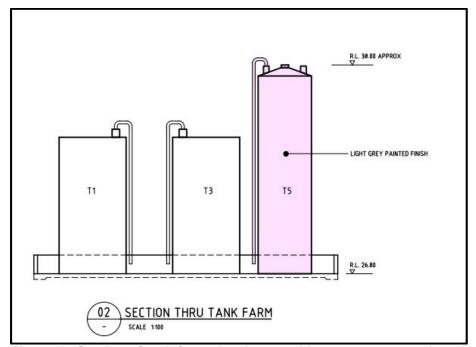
Section of tank farm showing new bitumen storage tank and existing tanks
